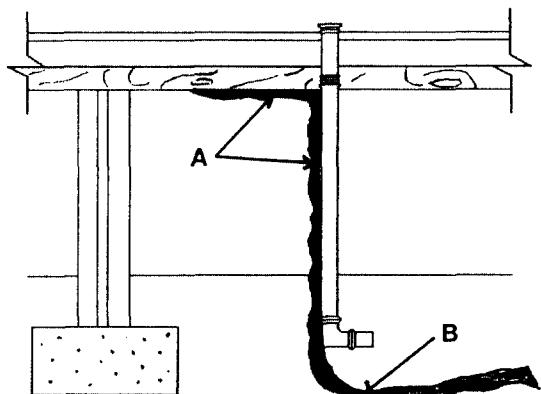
Termites gaining access from soil over foundation walls. A : Shelter tubes, B : Subterranean tunnels.
